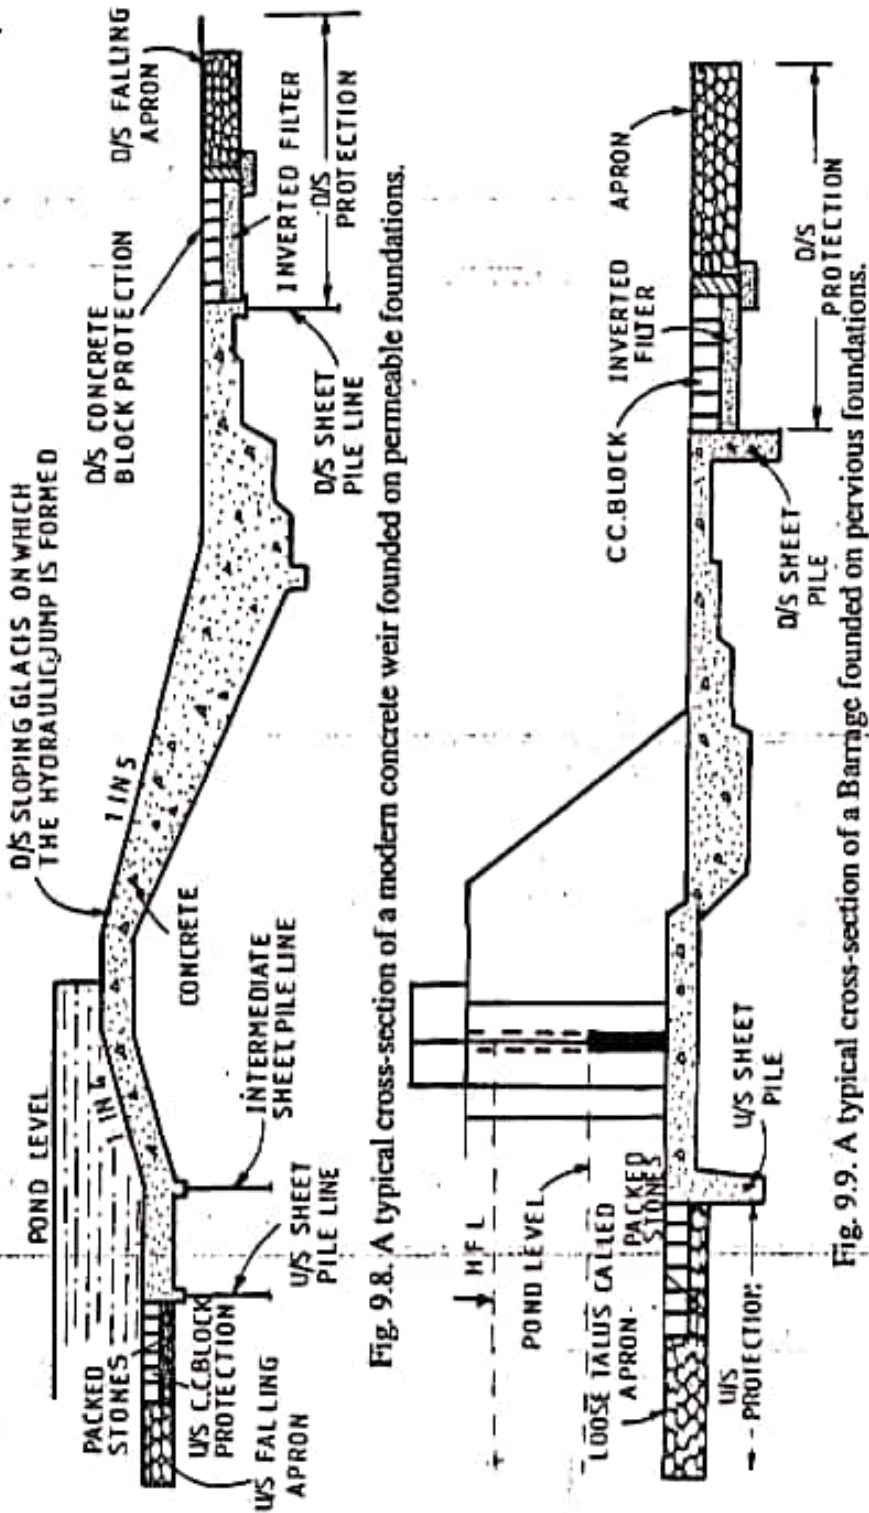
A typical cross-section of a modern concrete weir founded on permeable foundations.
